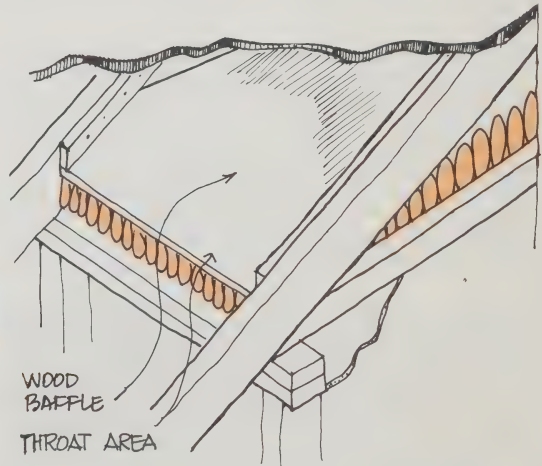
VARIOUS METHODS OF AVOIDING RESTRICTION OF ROOF SPACE VENTILATION WITH DEEP INSULATION.
